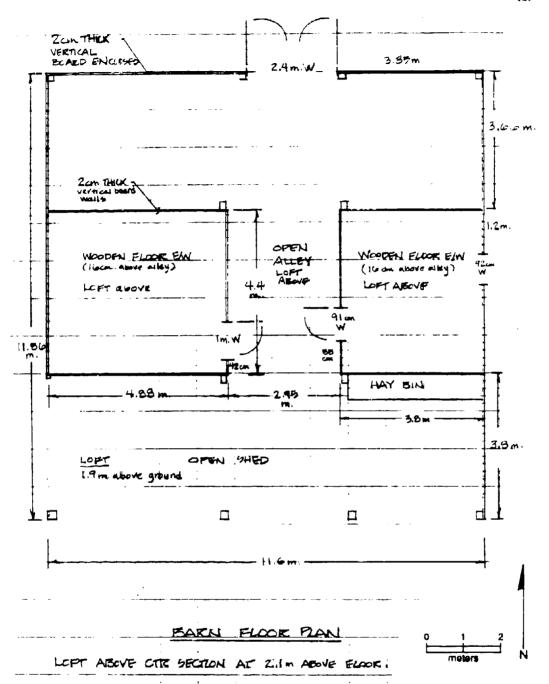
Field architectural floorplan for the standing barn at 41CO39.
